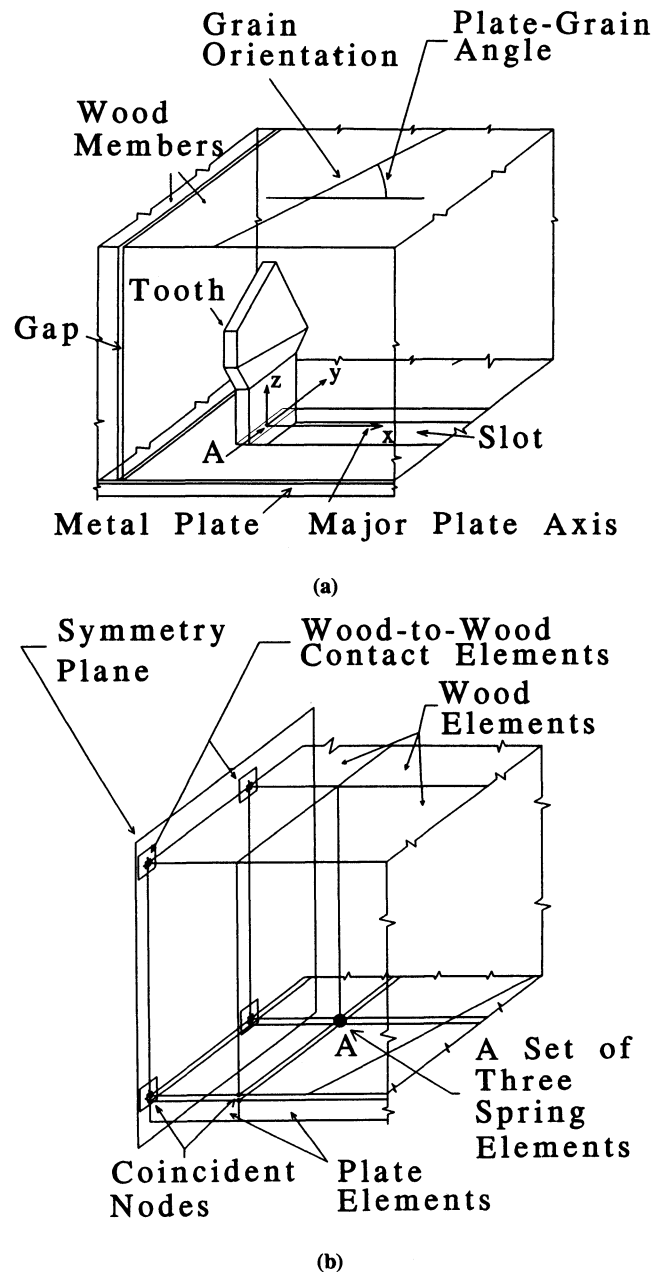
(a) Simplified schematic of a typical MPC joint: wood members, plate, plate-grain orientation, and (b) simplified schematic of a joint model: wood and plate elements, spring elements representing wood-plate interaction, and wood-to-wood elements.
